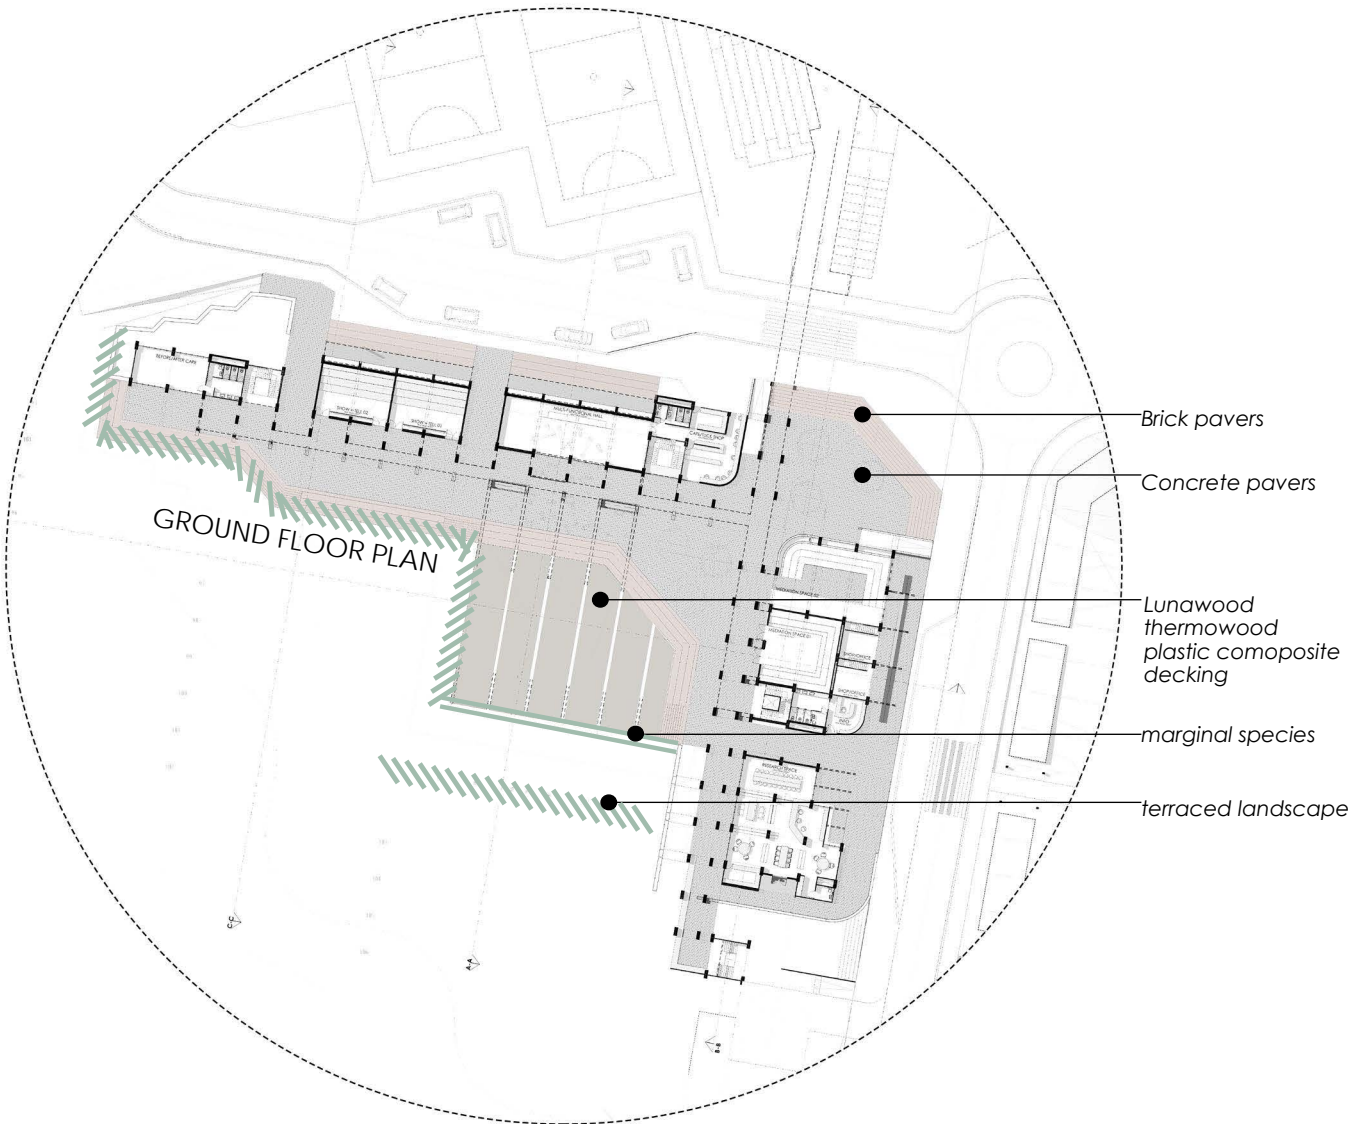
Proposed material palette for the external works and planting (Author, 2018)
